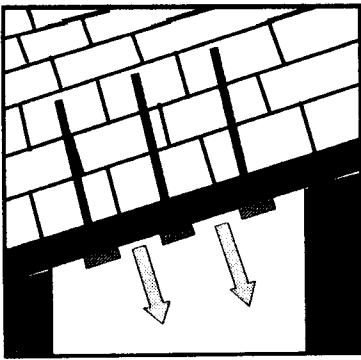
Local roof failure due to insufficient rock confinement.
